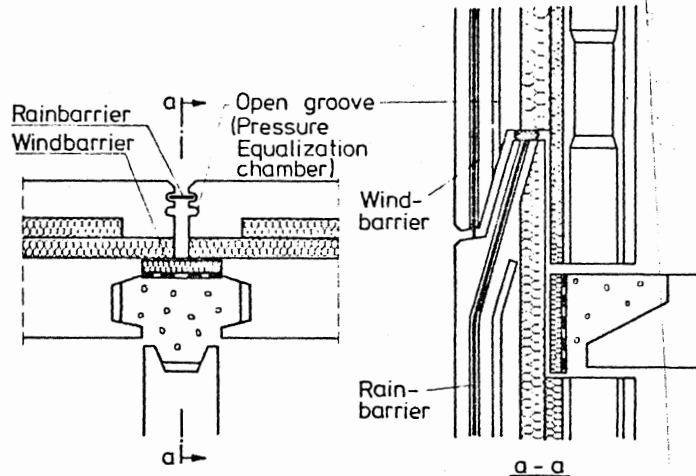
Employment of two-stage joints with concrete sandwich walls. The profiling is performed directly on the concrete.
